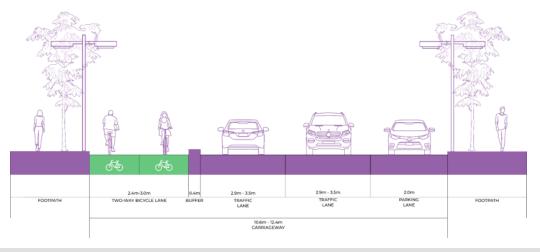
Typical cross-section of a street with a bi-directional cycleway with single parking
